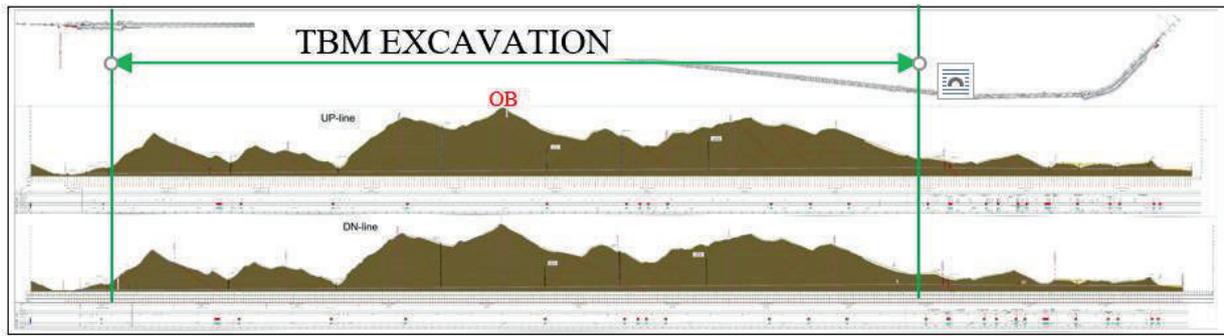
Topography along Tunnel 8 showing stretch excavated by TBM (Highest OB is 855 m)
